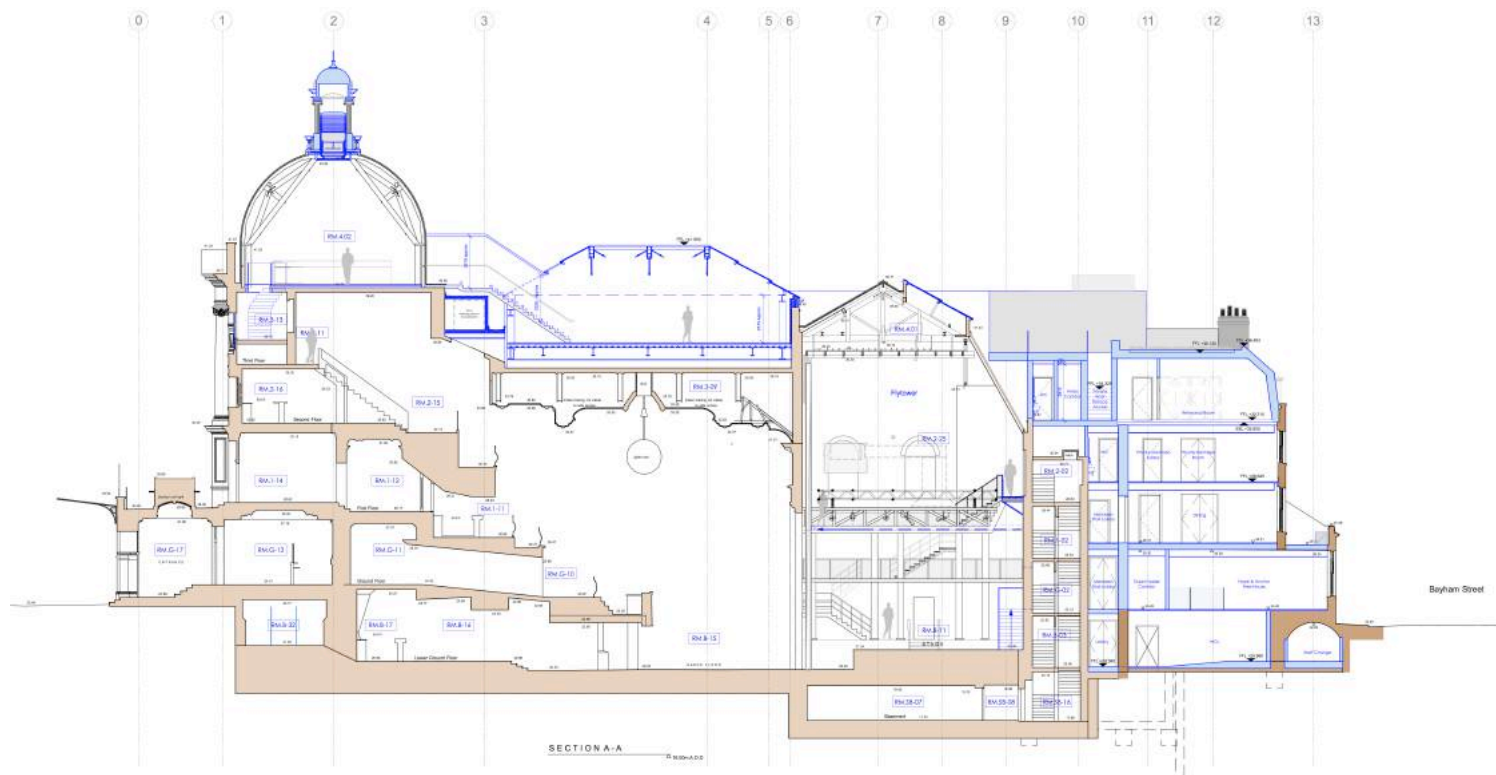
Proposed section AA through the dome, rooftop lobby, flytower and the Hope & Anchor.
